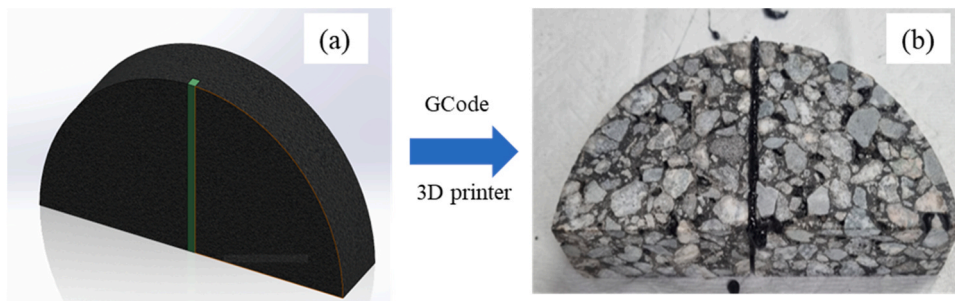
Construct crack in 3D program (a) and crack filled sample by 3D printer (b).
